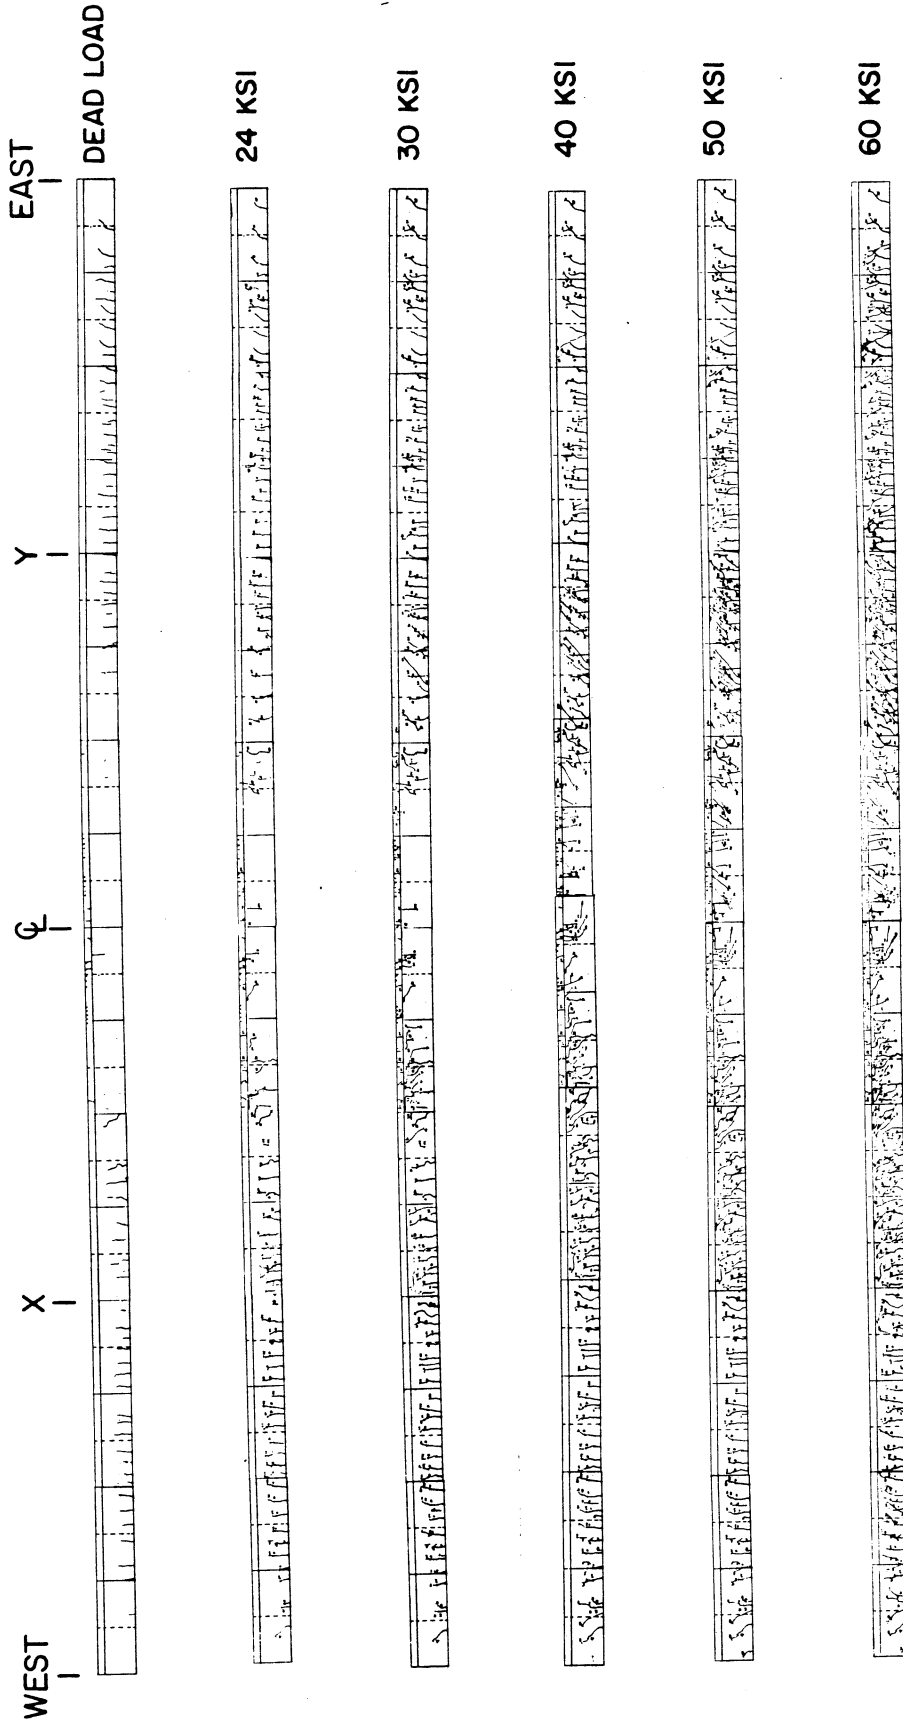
CRACK HISTORY FOR INNER GIRDER 1 (SOUTH FACE)
